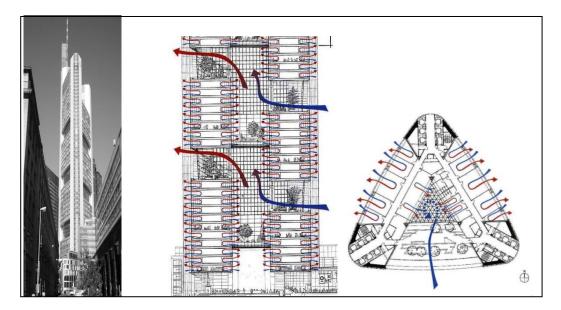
18: Commerzbank tower section and plan (air flow in sky court + atrium) (Al-Kodmany, 2015)
